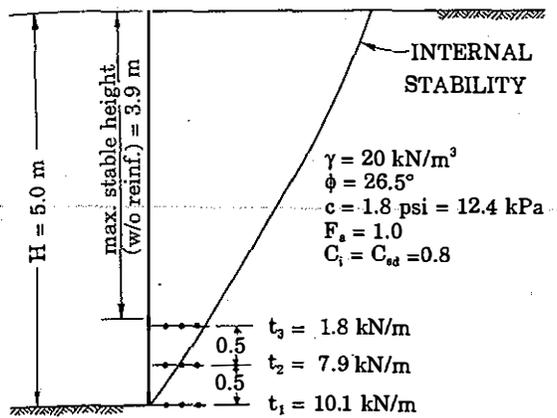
Layout for a cohesive slope considering *reactive* reinforcement forces.
